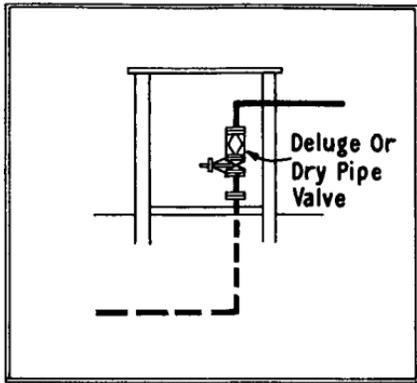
Typical deluge fire protection arrangement for counterflow towers.
